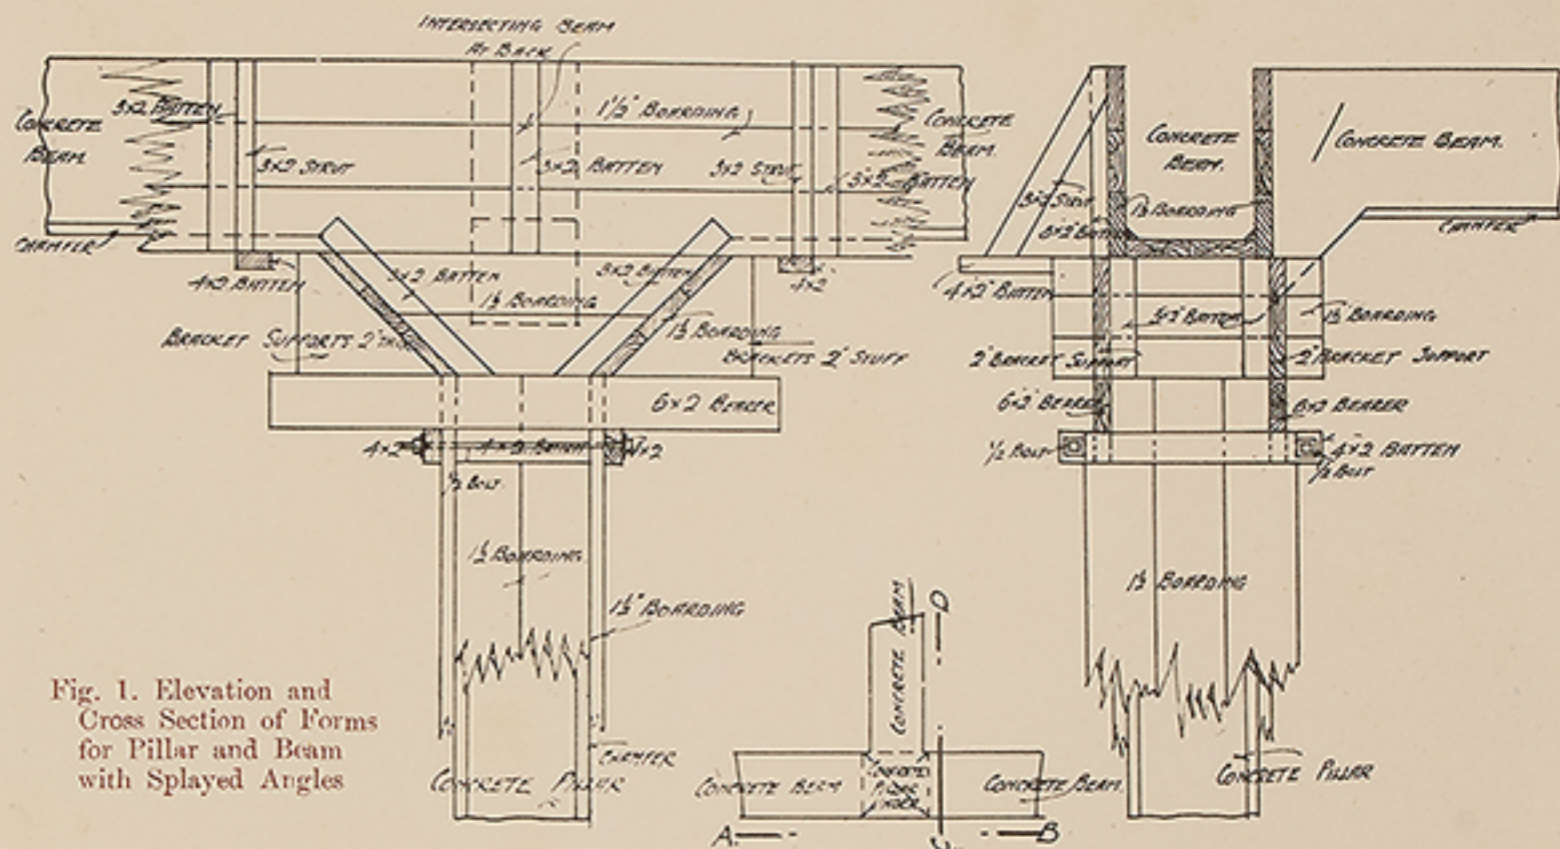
Elevation and Cross Section of Forms for Pillar and Beam with Splayed Angles
